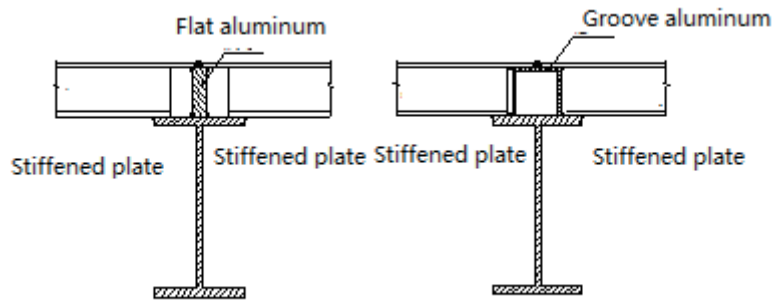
Connection of stiffened plate at transverse primary member (2)
